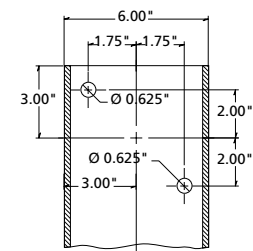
DETAIL POST ASSEMBLY 6 x 4 FRONT ELEVATION
